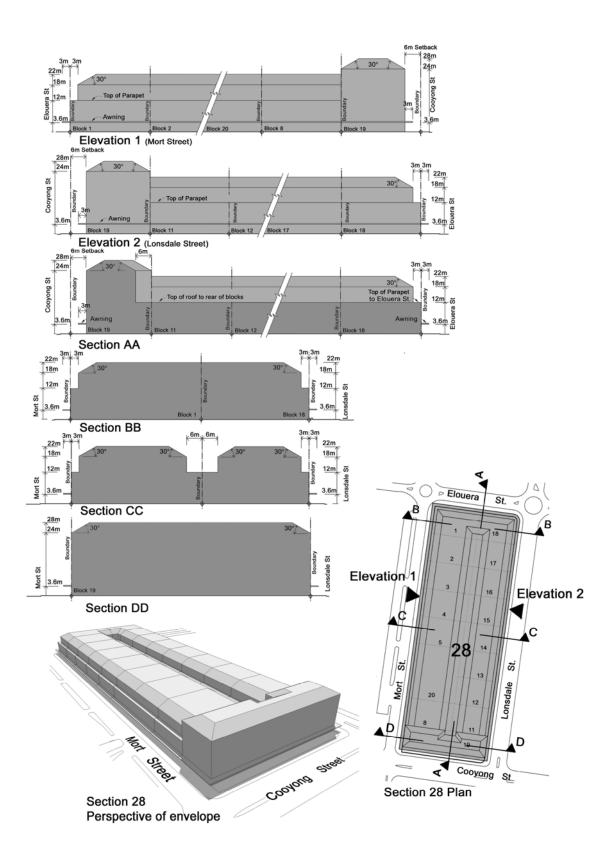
Building Envelope Diagram - Braddon Section 28 (CZ3 Zone)
